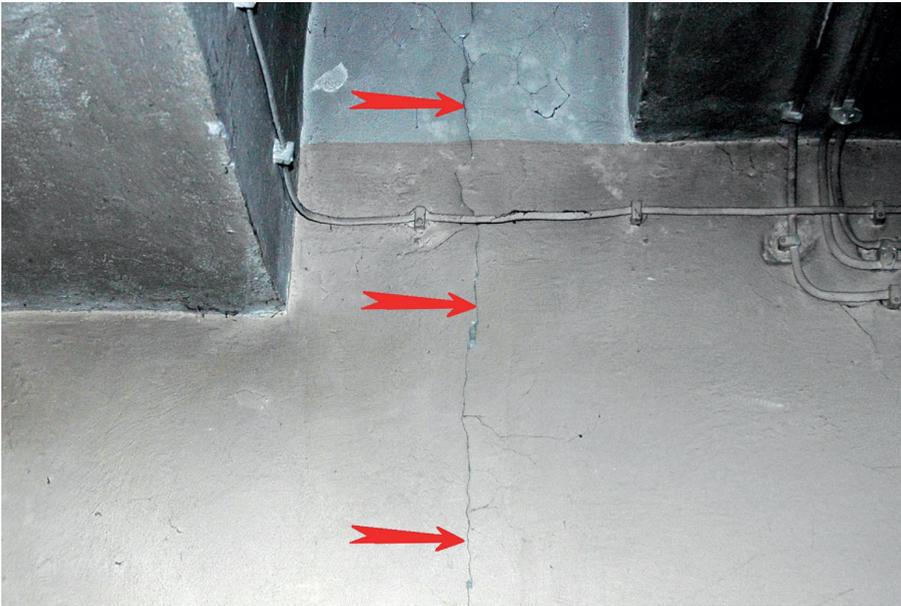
1 mm crack at the bricked up and plastered expansion joint between segments 2 and 3 at ground level. *Source: author
